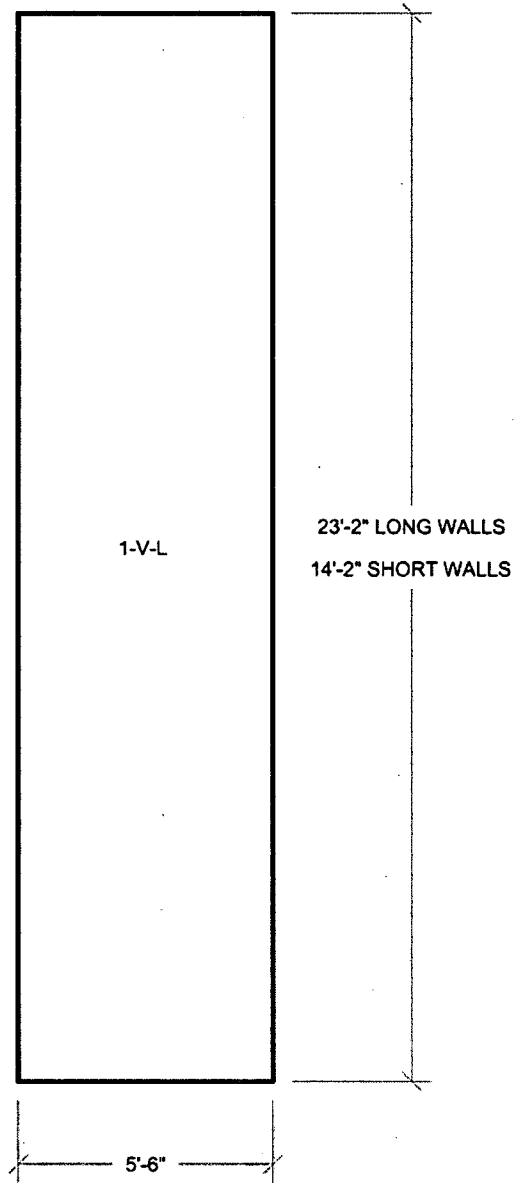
H.7-10: Access Region Walls Looking From Outside Vertical Reinforcement Zones Near Side and Far Side Faces
